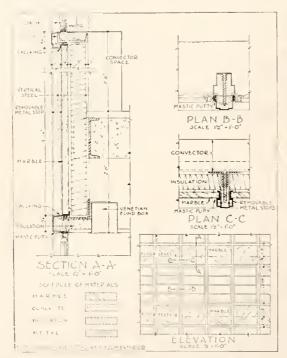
Detail Plate No. F from Marble Institute of America's Standard Specifications For the Support, Anchorage and Protection of Exterior Marble Veneer Two Inches and Less in Thickness and Exterior Marble Used in Curtain or Panel Walls.
